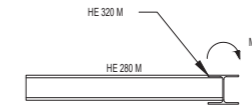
Longitudinal section of the cantilever loading the border beam
